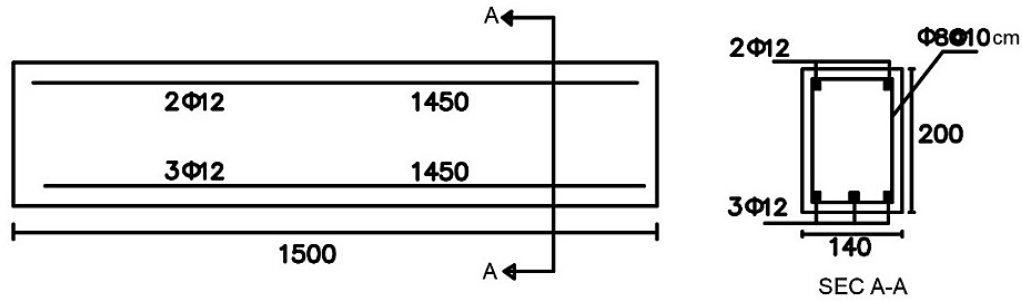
Geometric details and reinforcement of beams specimens (Dimension in millimeters)
